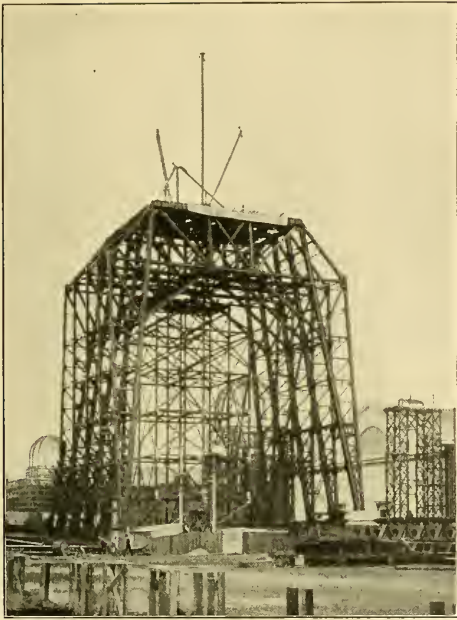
STEEL FRAME OF TOWER OF JEWELS TO ELEVATION 152 FT.
